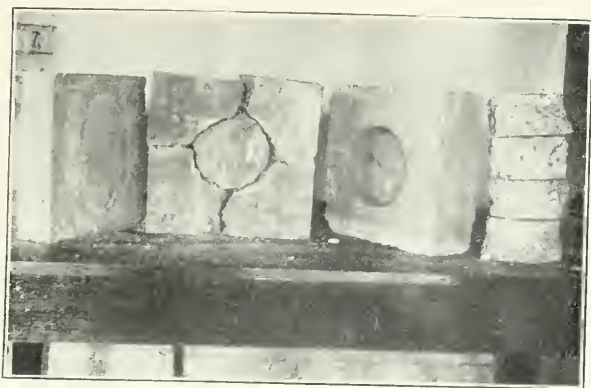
VIEW SHOWING RECESSED BLOCKS AFTER FAILURE.
